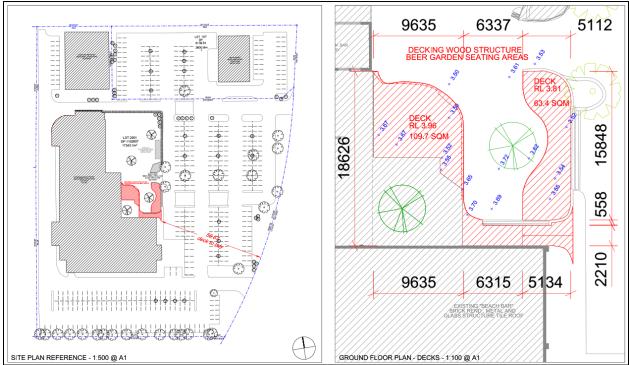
Site Plan and Ground Floor Plan of the timber decks (Source: CMT Architects Australia)
